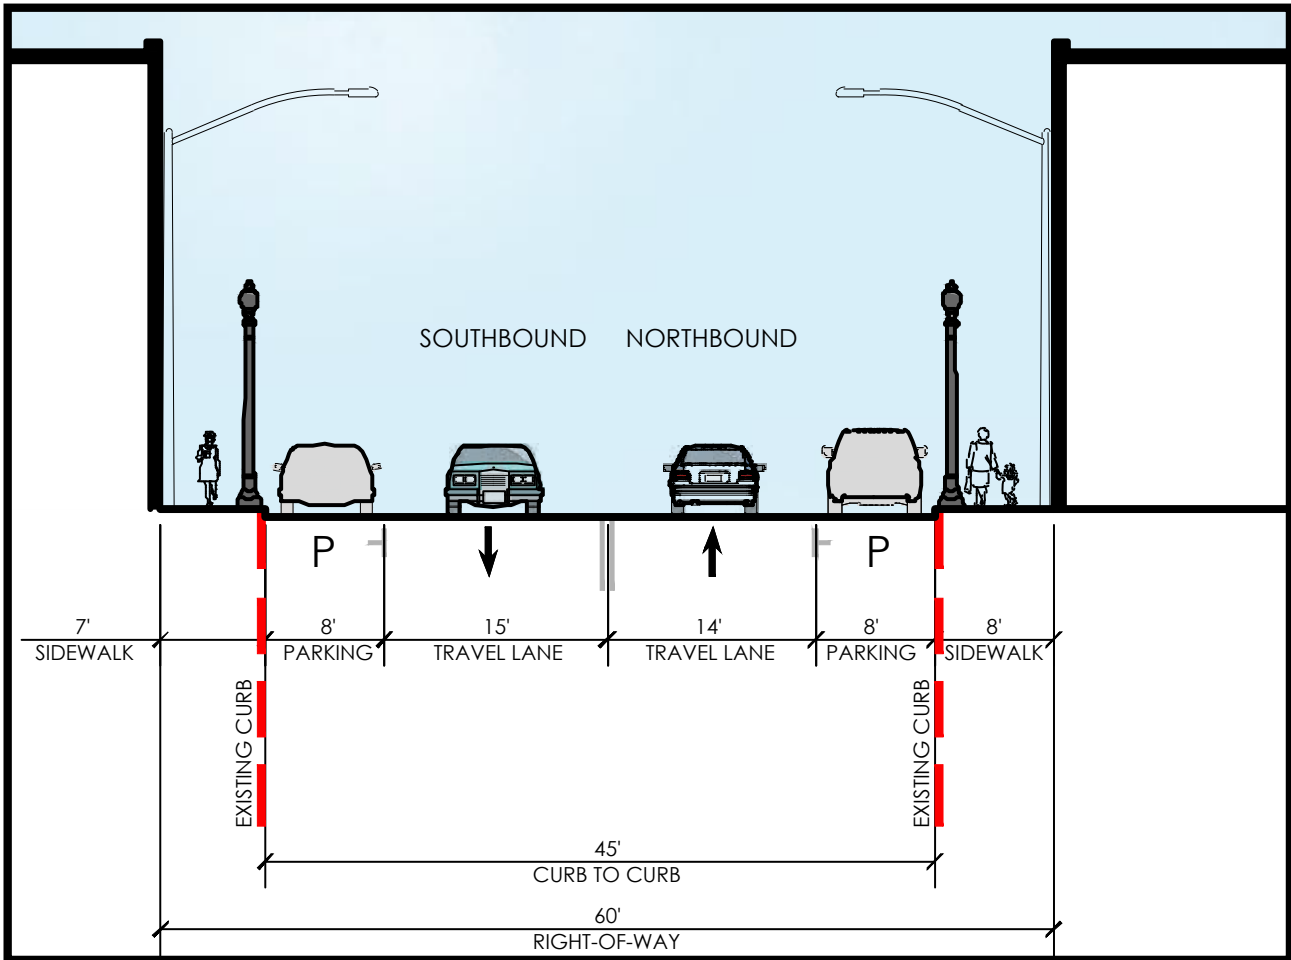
, State Street: Existing Conditions Section - North of Christiansen Avenue and South of Carlsbad Village Drive
